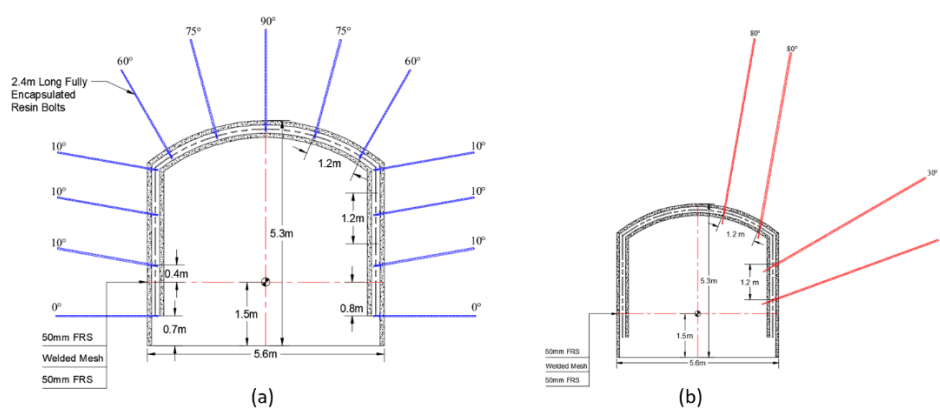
Schematic showing ground support in squeezing ground at RA-UG mine (a) primary rebars (b) secondary cable bolts
